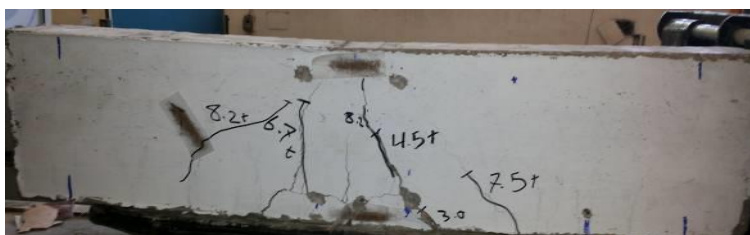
Crack Pattern and Mode of Failure of a Non-prestressed beam with CNT under Elevated temperature (RC –CNT-400)
